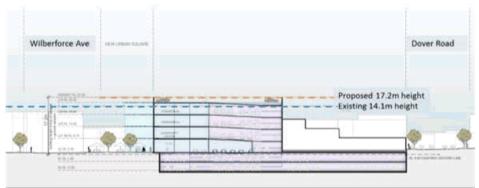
Section between Wilberforce Avenue and Dover Road showing the existing and proposed maximum building heights, concept for the site and surrounding existing buildings
